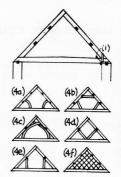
IV. Butt-Purlin Hammer-Beam Trusses.
